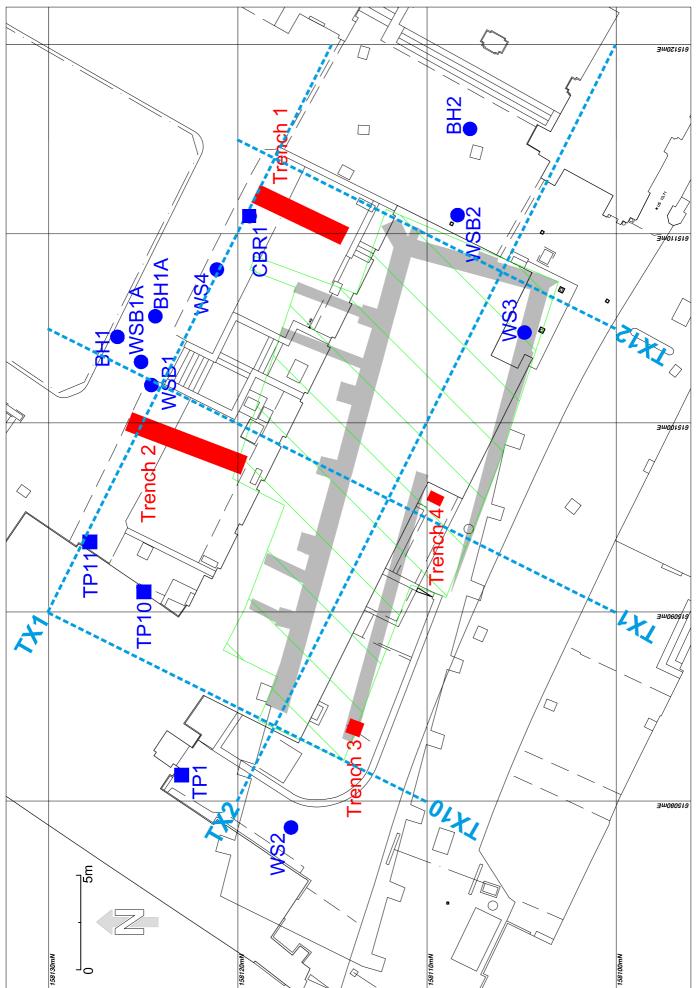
Plan showing evaluation Trenches 1 and 2, evaluation pits (Trenches 3 and 4), geotechnical test pits (TP and CBR), boreholes (BH) and windowless samples (WS).
